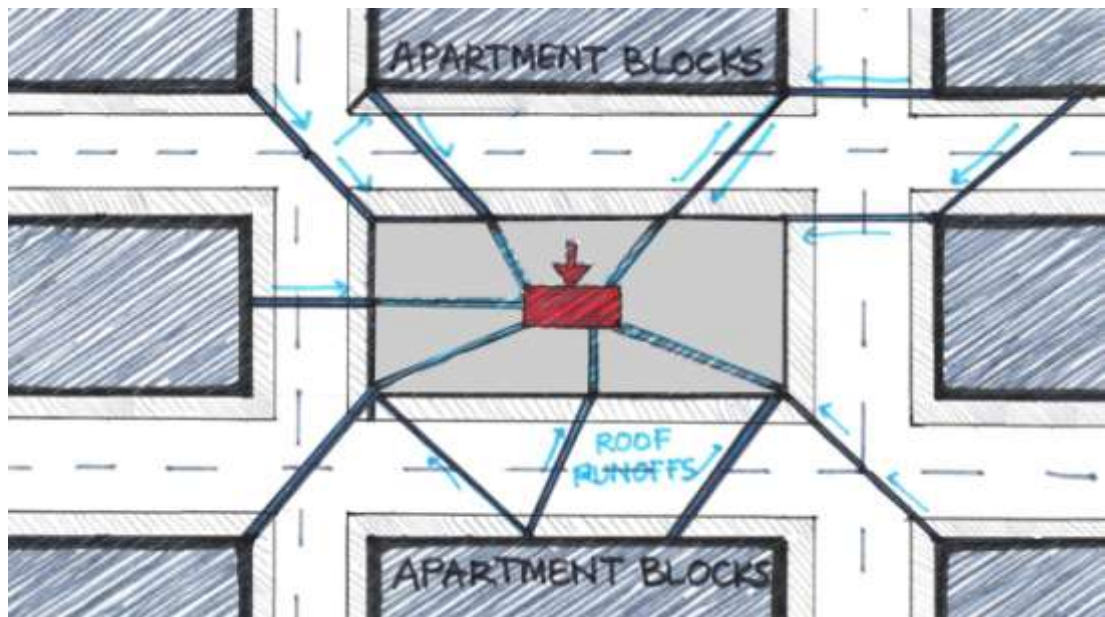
A Site Plan Sketch of Apartment Blocks (sketch by author)
